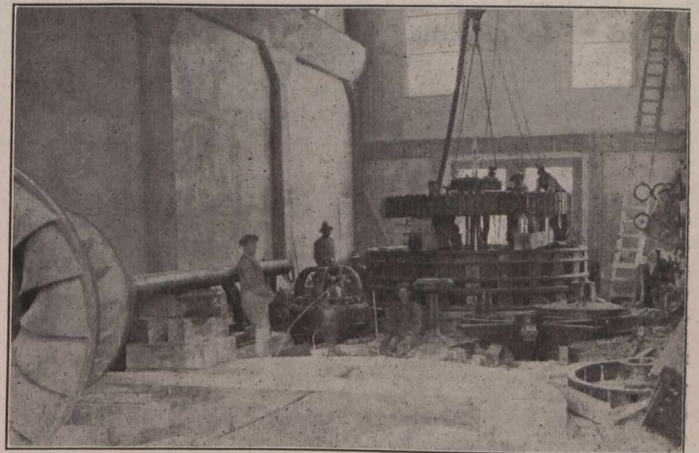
Erection of No. 1 Generator. The View Also Shows the Shaft and Lower Runner of No. 2 Turbine.
